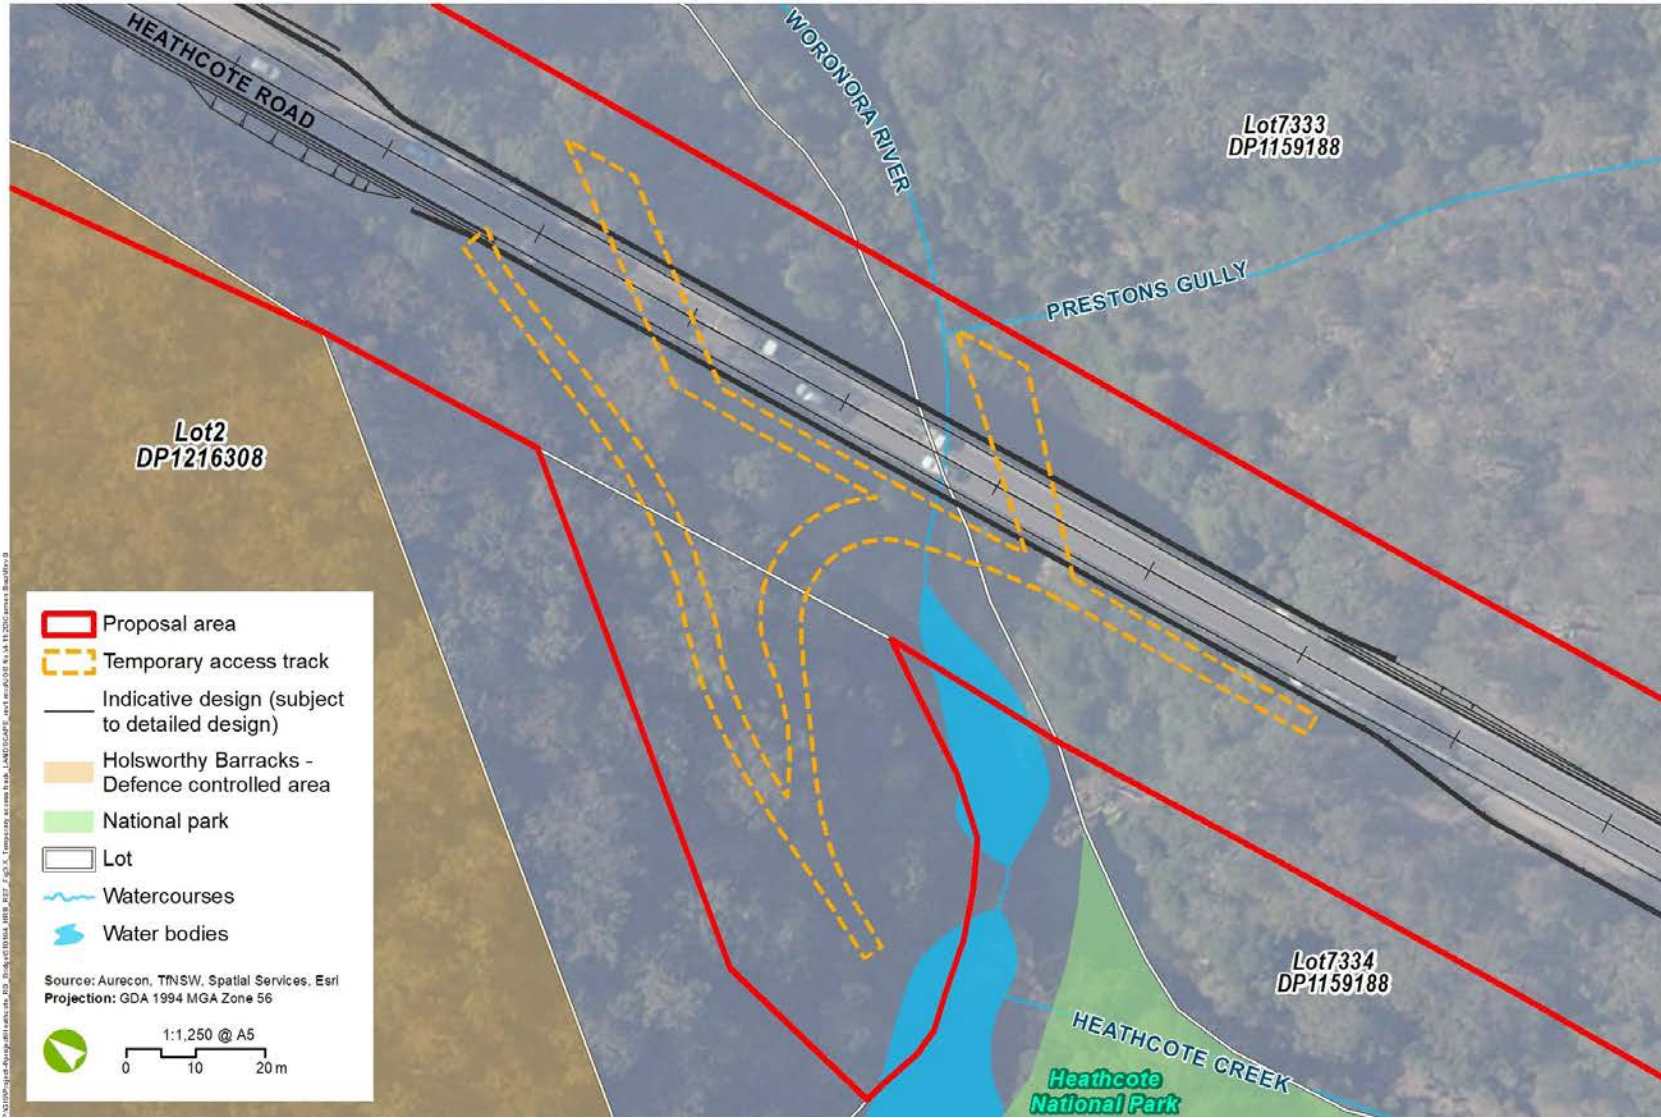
Location of temporary access track, laydown area and waterway crossing
